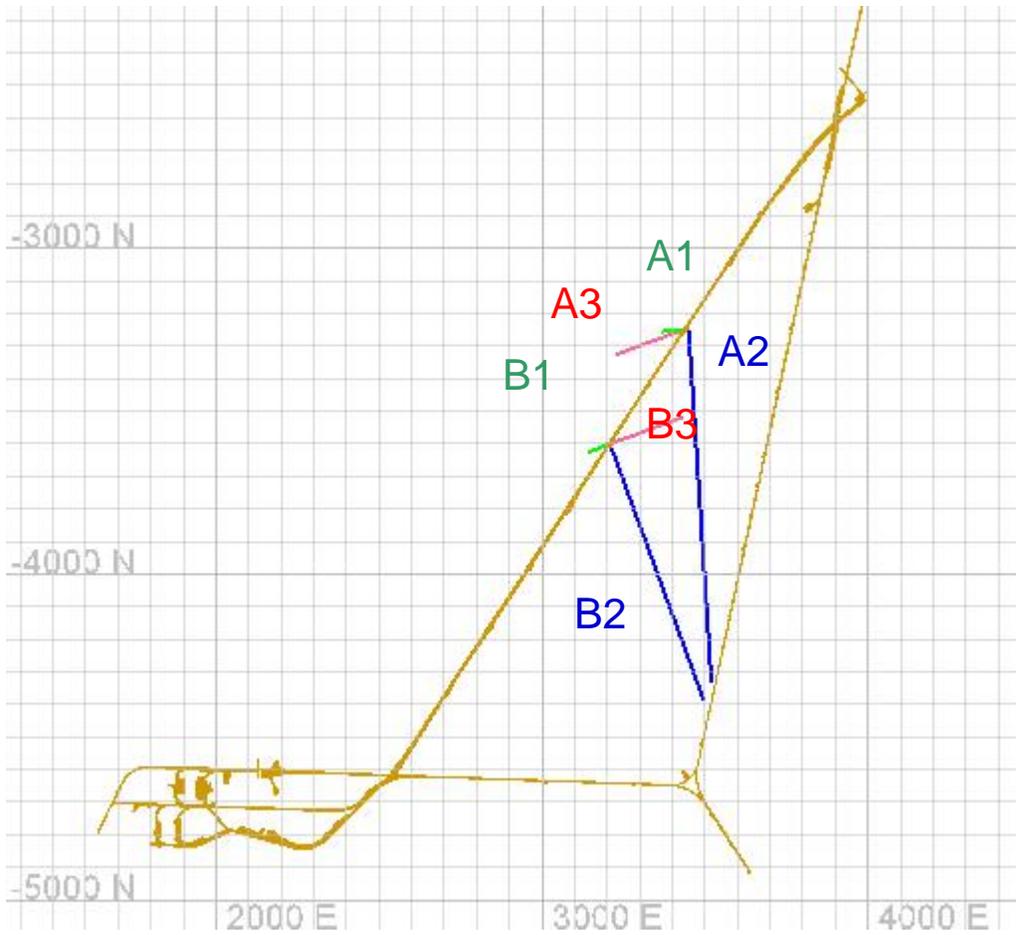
Drill hole location and orientation – plan view; grid in feet.
